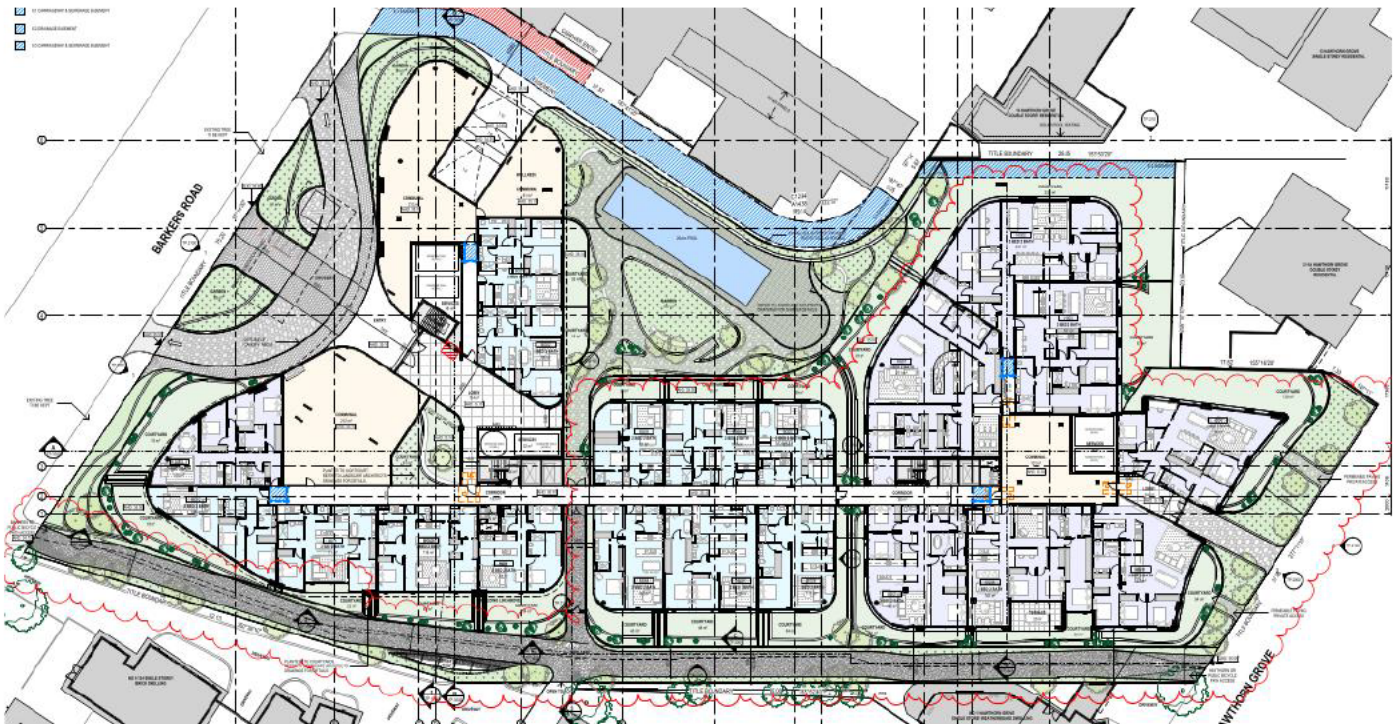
Ground floor plan of proposal showing location of shared path, communal open space, footprint of all three building segments etc. in context with surrounding built form.
